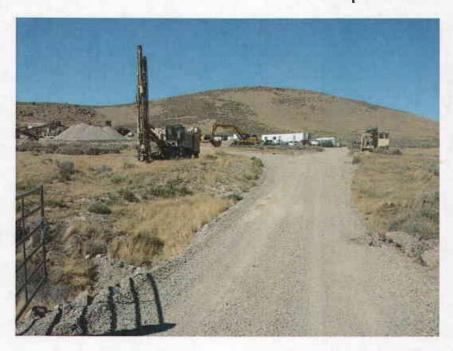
This view, also from the gate location, shows additional equipment, including crushing equipment and a conveyor, and also a waste rock pile.
